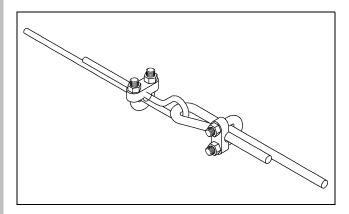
N Cable-to-Cable or Cable-to-Rod Connections
